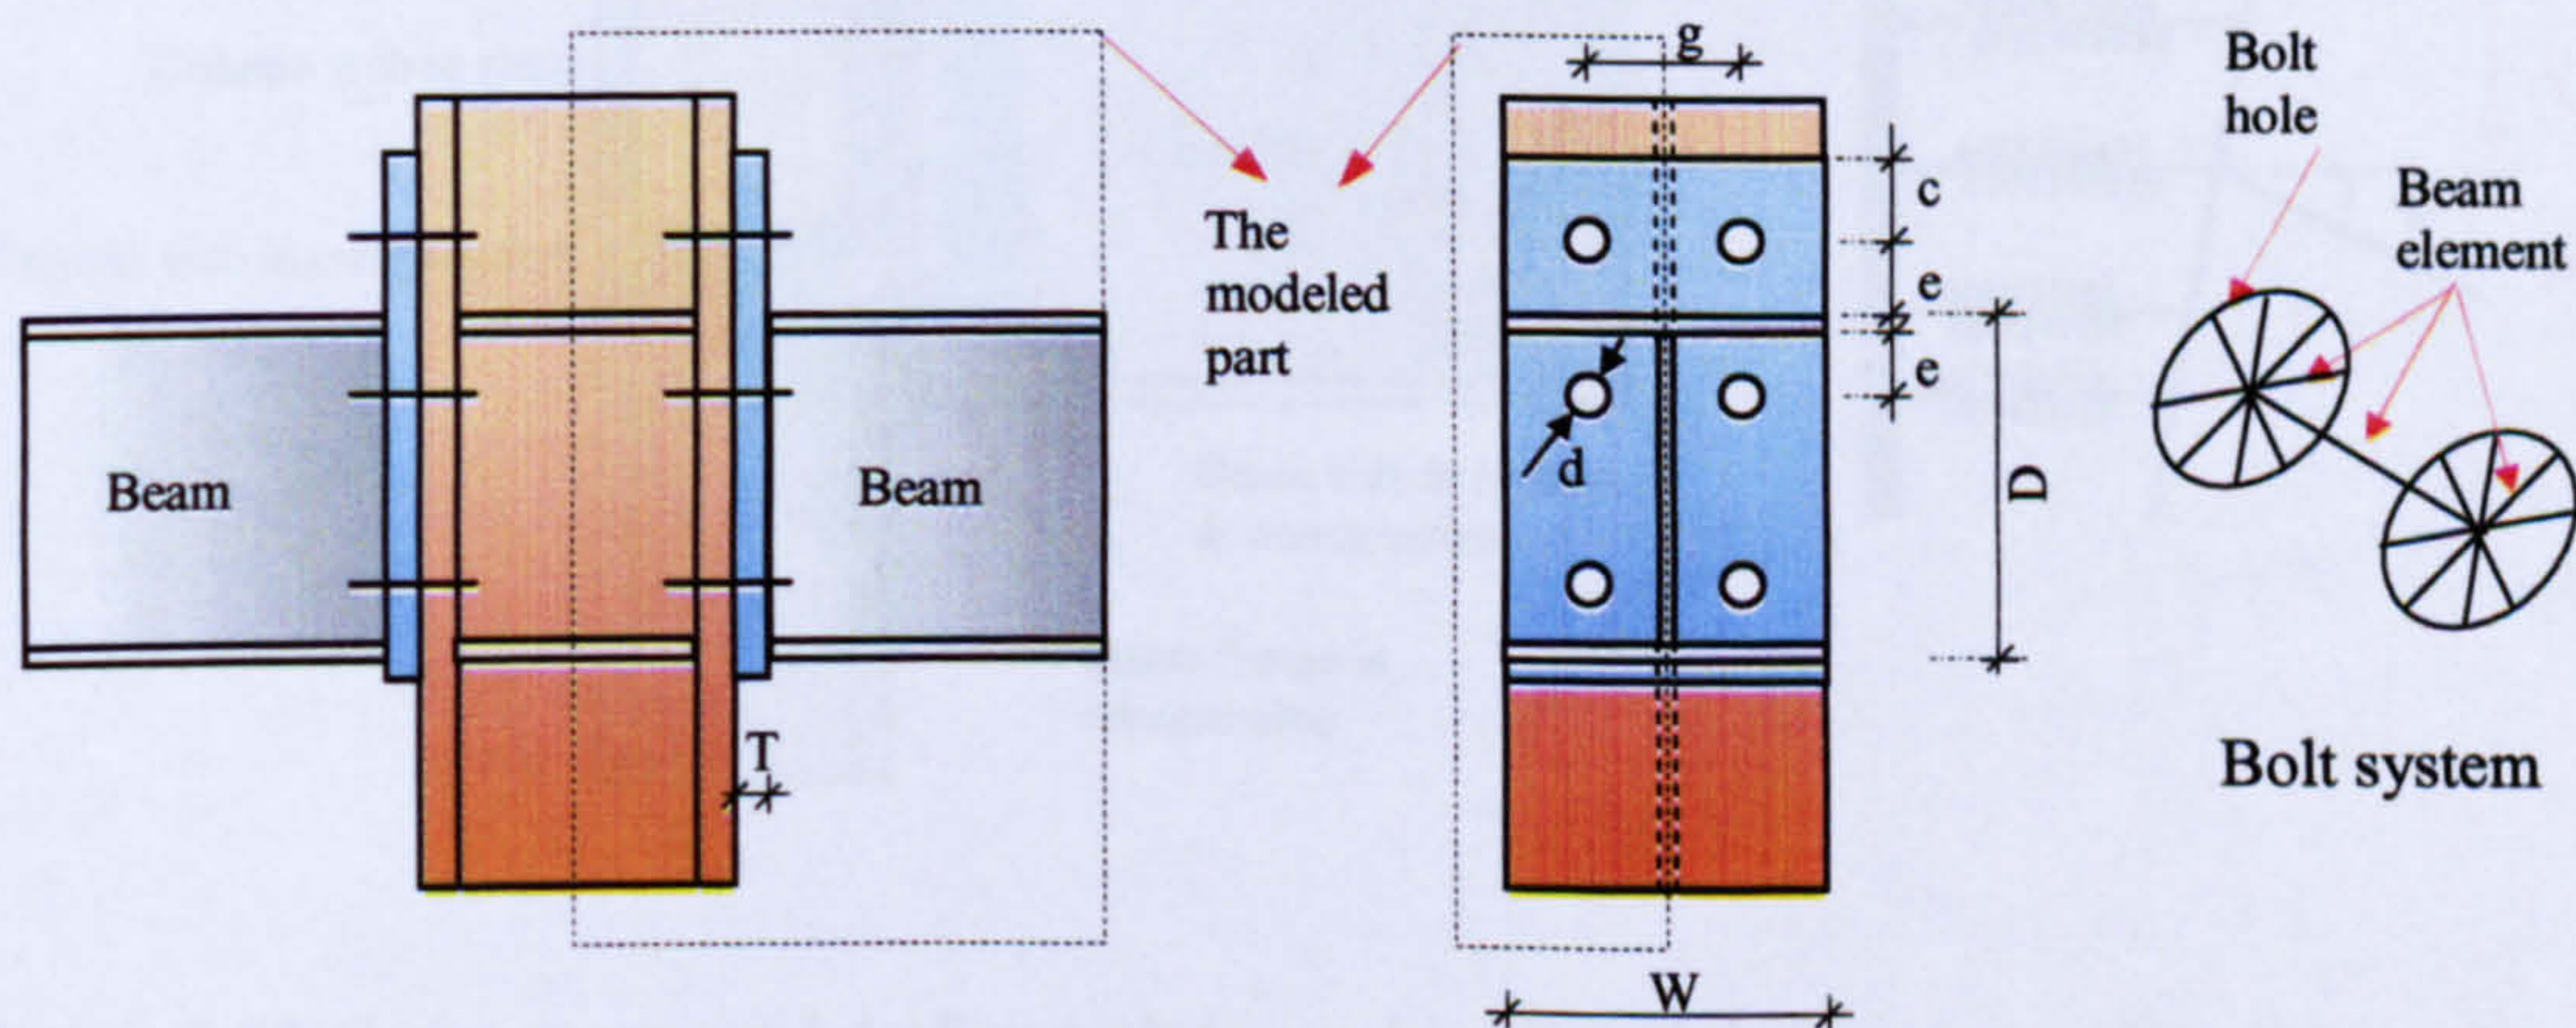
Details of the El-Houssieny, *et. al.* connection parameters
